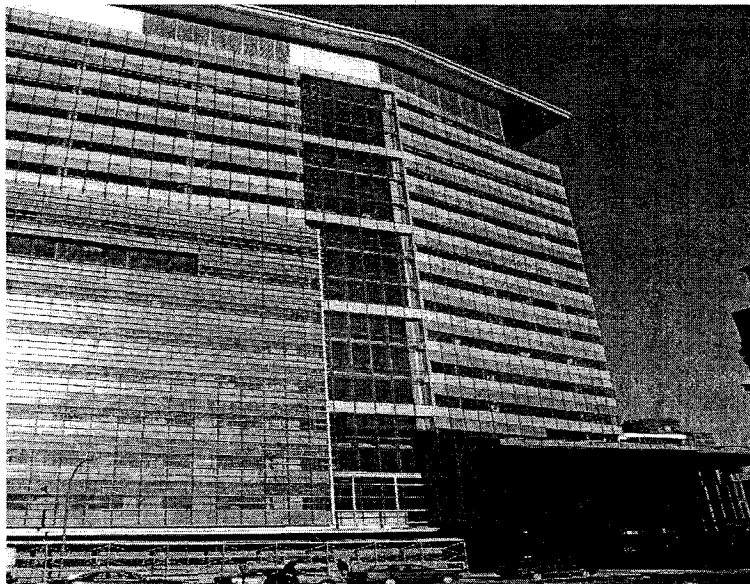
Guy Street facade (SW) of new Engineering building (note the repeating floors with three sections each – spandrel, middle viewing section and upper fritted glass section).
